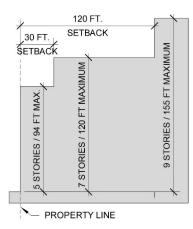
SECTION AT BELLEVUE DRIVE AND MT. VERNON AVENUE - SOUTH
